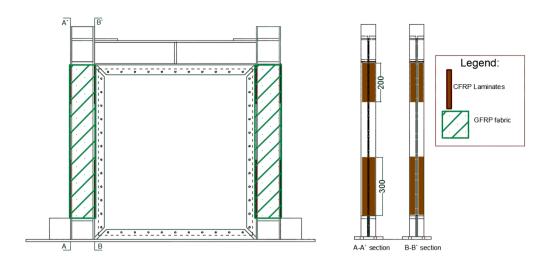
Retrofitting scheme: position of CFRP laminates on shear wall columns (A-A and B-B sections)
